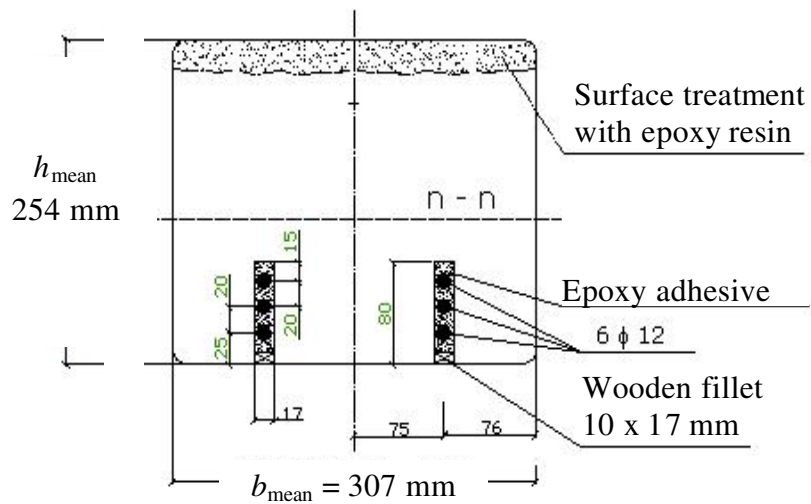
Cross section of a timber beam reinforced with embedded steel bars
